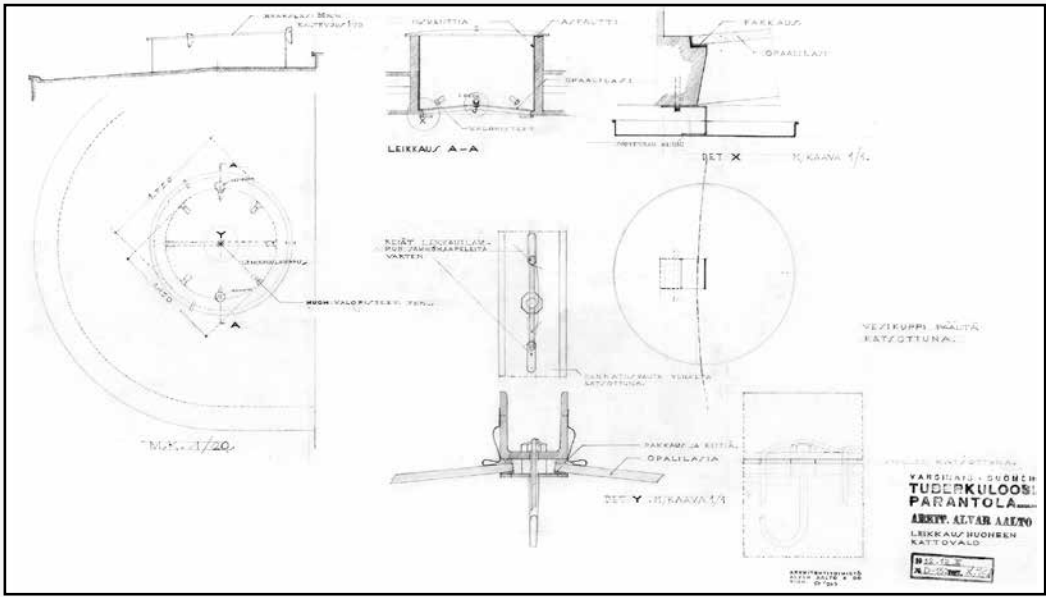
The skylight in the operating theatre. Drawing No. 50-267. The drawing has been edited. AAM.
